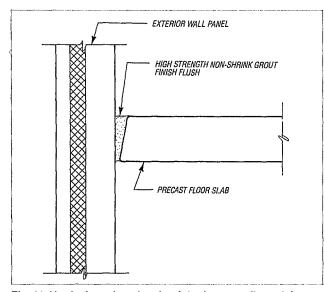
Vertical section showing joint between floor slab and exterior panel.
